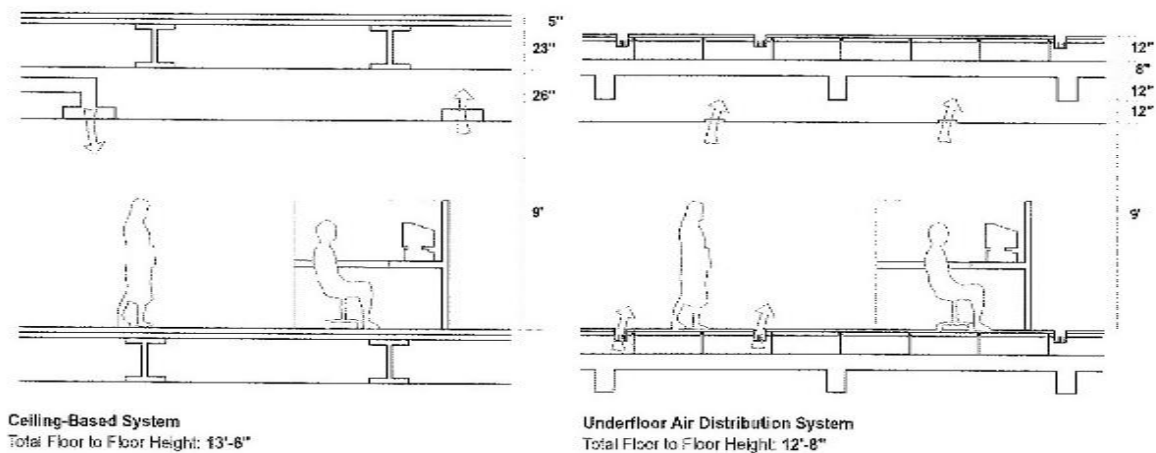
comparison of typical floor-to-floor heights for ceiling-based and UFAD system (Bauman, 2003).
